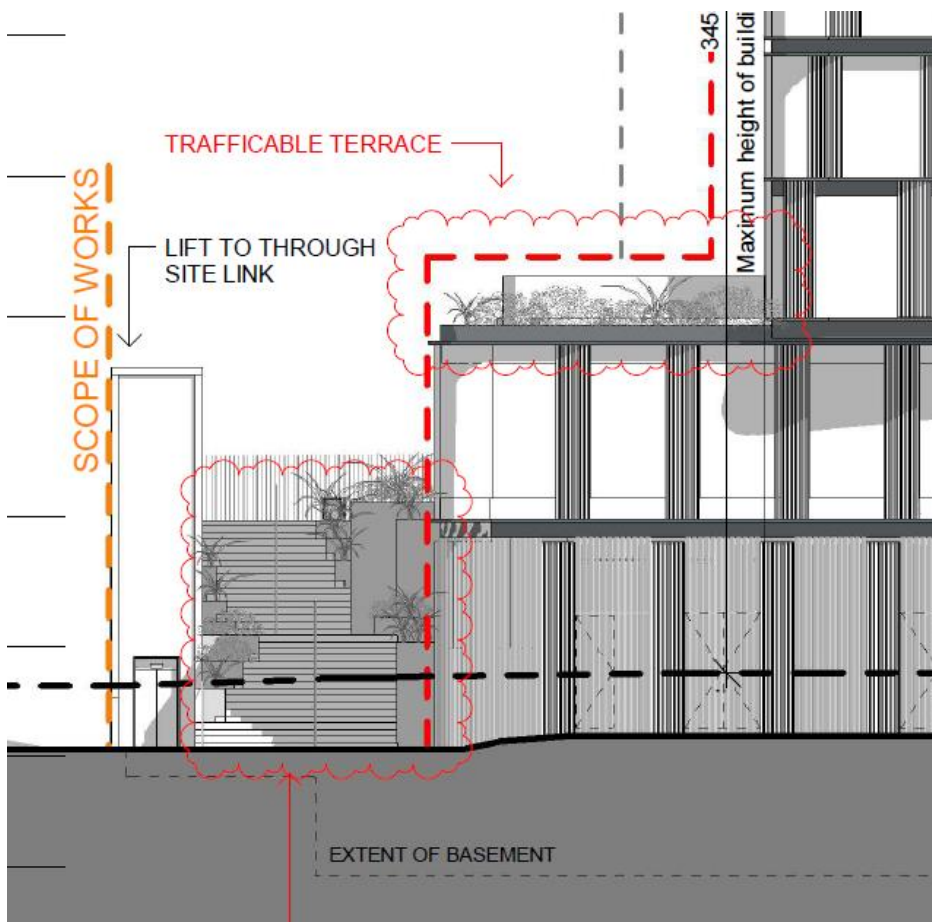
Extract of north eastern elevation of Building C, showing through site link as viewed from Talavera Road
